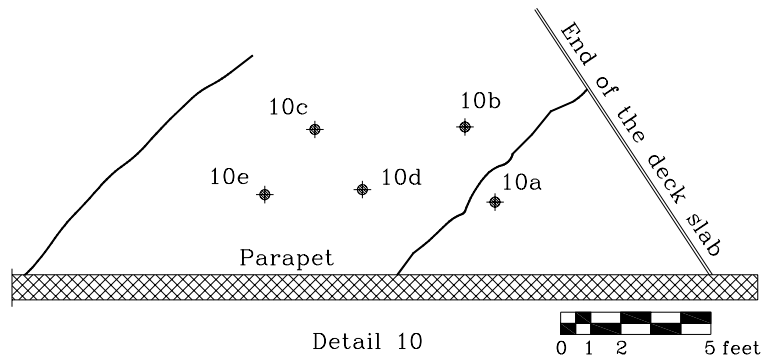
Map of cracks at coring locations for Bridge Deck Number 10 (Structure No. R03-25132)
